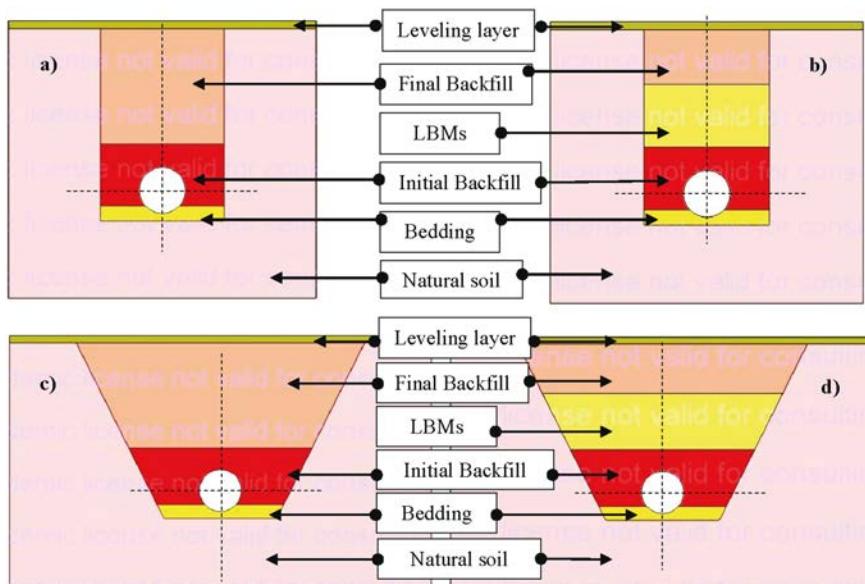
Models of the pipe-soil system: a) narrow trench, filling with soil, b) narrow trench, filling with LBMs layer, c) wide trench, filling with soil, d) wide trench, filling with LBMs layer
